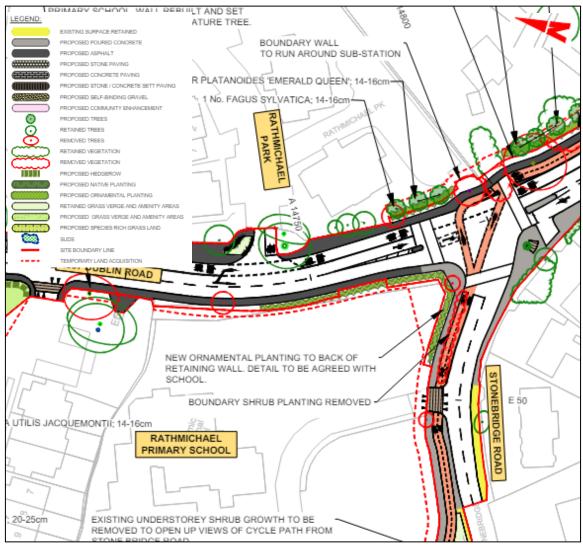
Extract from Landscaping General Arrangement Drawings (Sheet 42)
